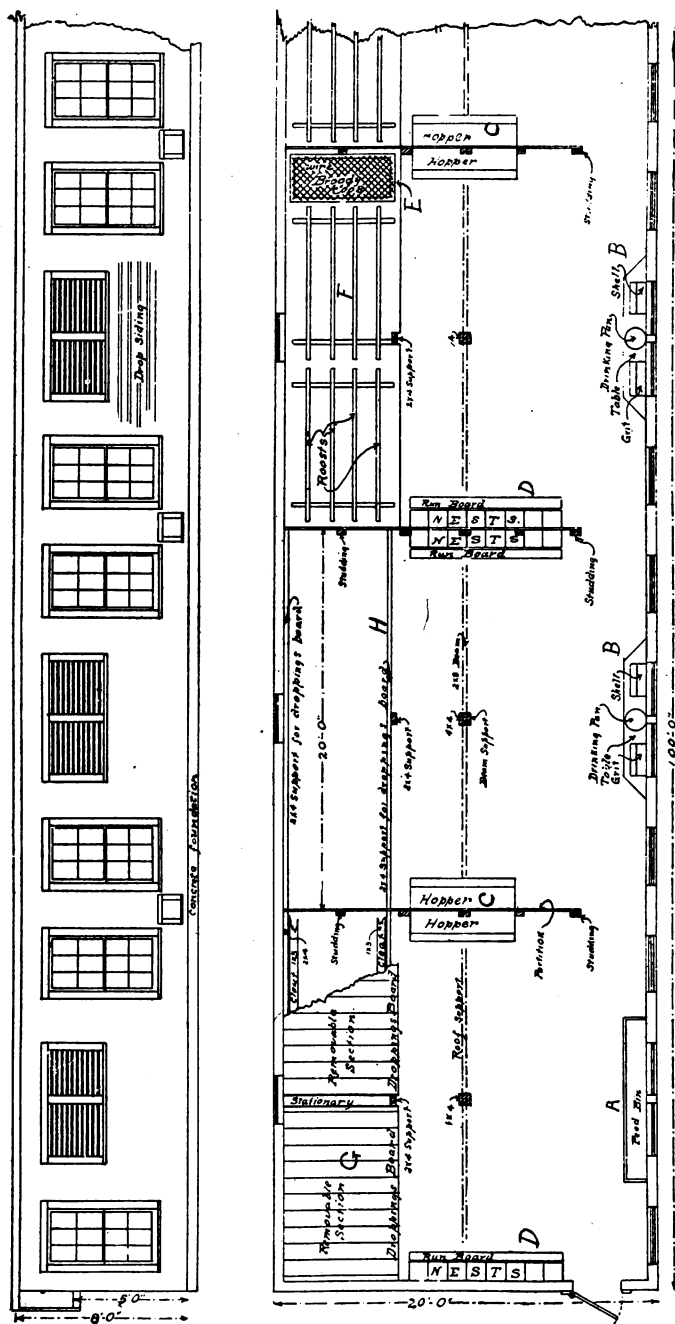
THE QUISENBERRY FOOL-PROOF LAYING HOUSE. 20x100 FEET
